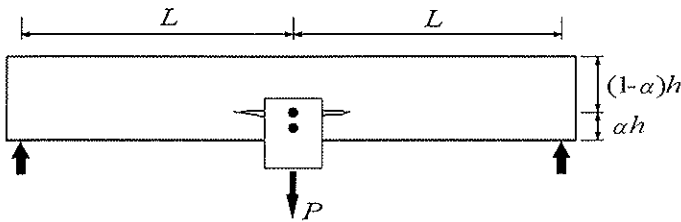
Splitting failure in beam loaded perpendicular to grain by a single joint
